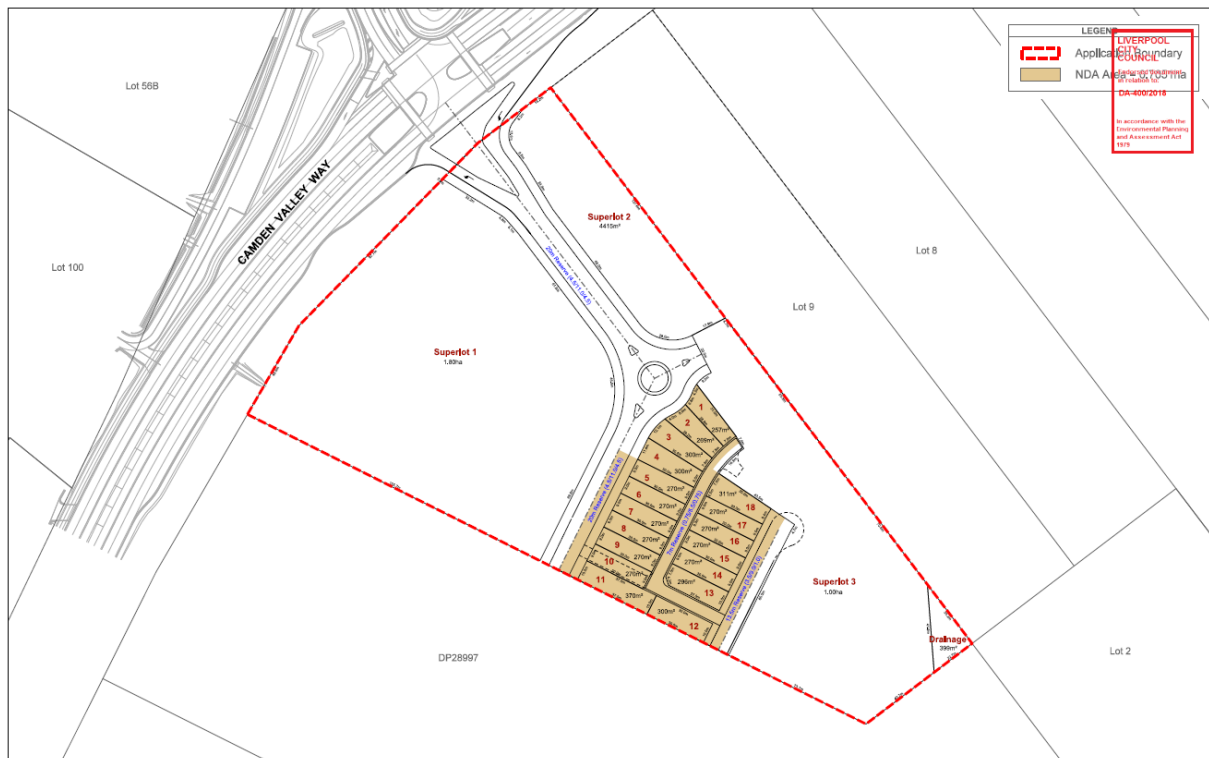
Extract of proposed Subdivision Plan in association with the approved subdivision plan (DA-400/2018)
